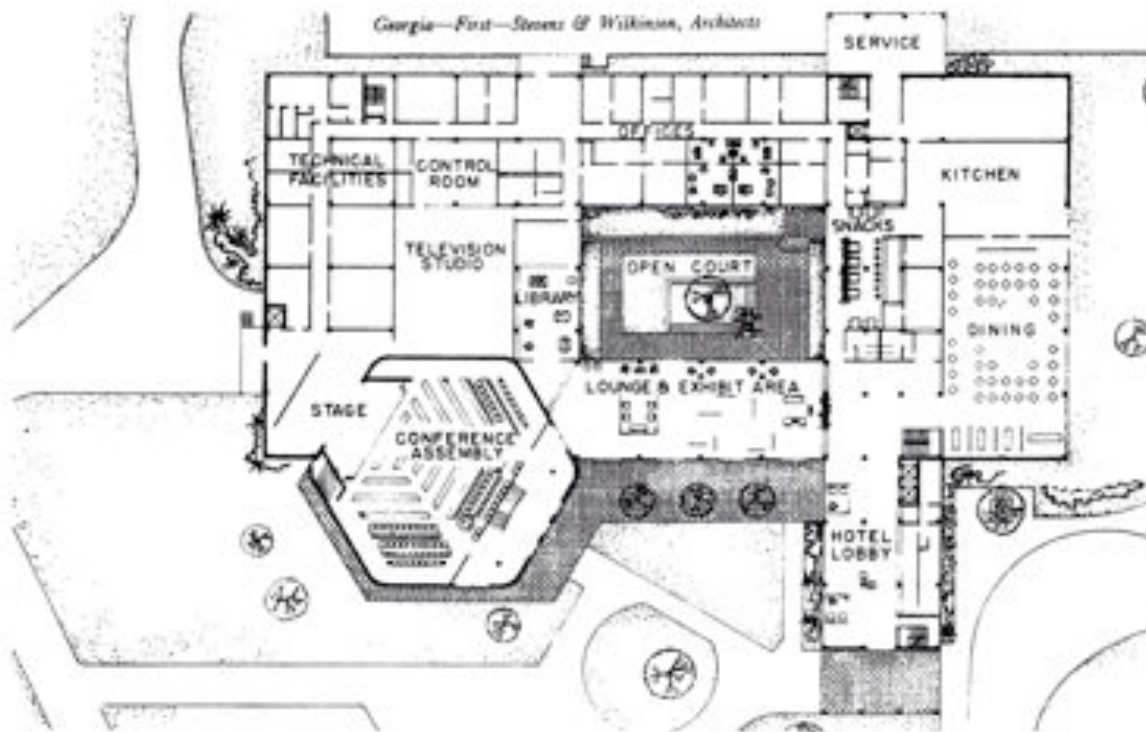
Georgia Center for Continuing Education Floor Plan, First Floor.
